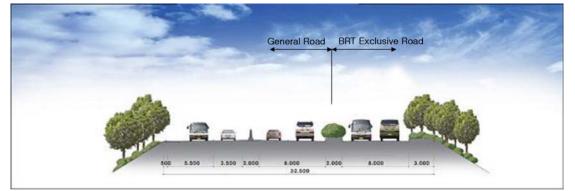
Cross Section View of An Exclusive BRT Road Along With General Road
